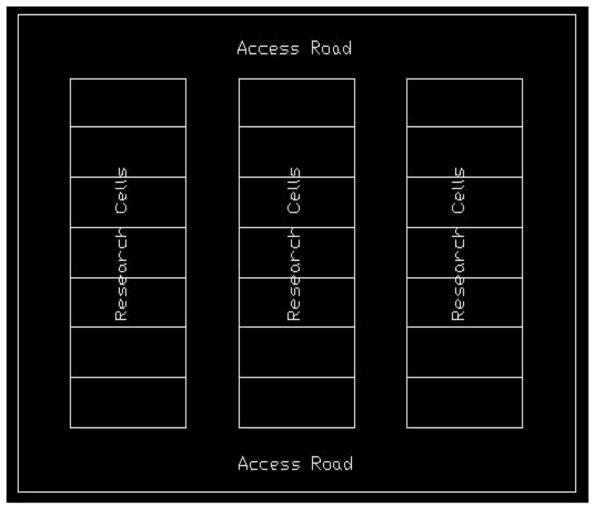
Typical layout of a plot with access roads at the Starfire Mine.
